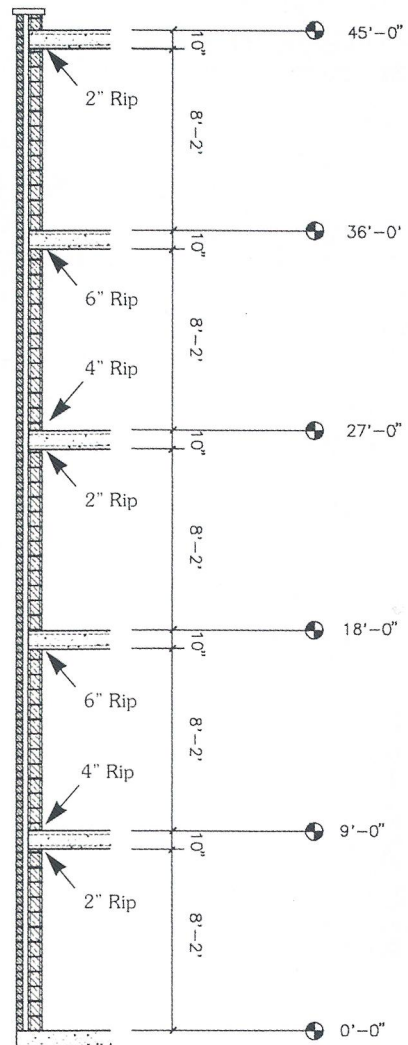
8" Precast Concrete Slab with Multi Wythe Masonry Wall
